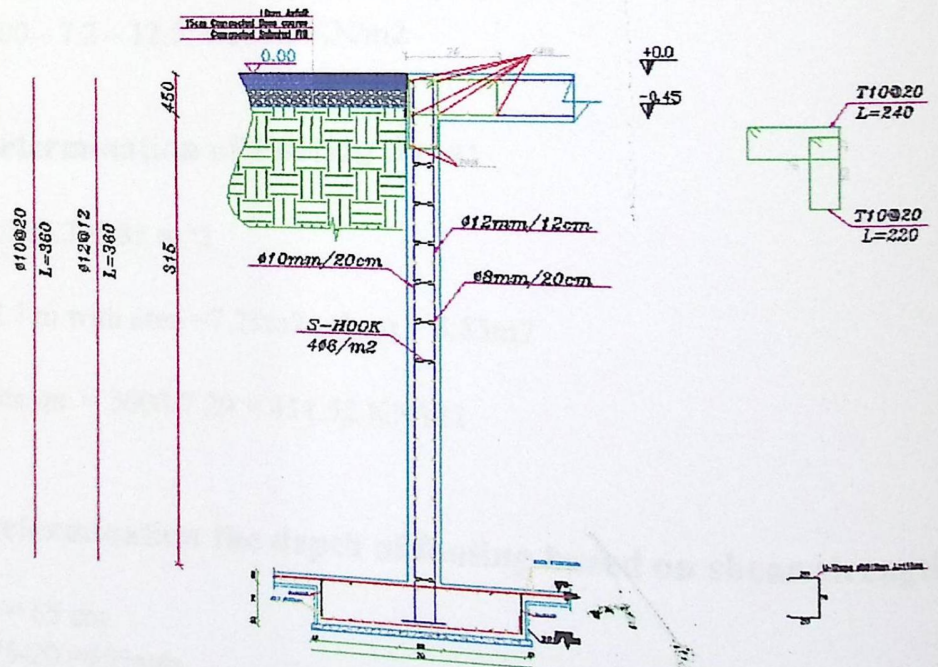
Reinforcement Detail of Basement Wall (BW)
